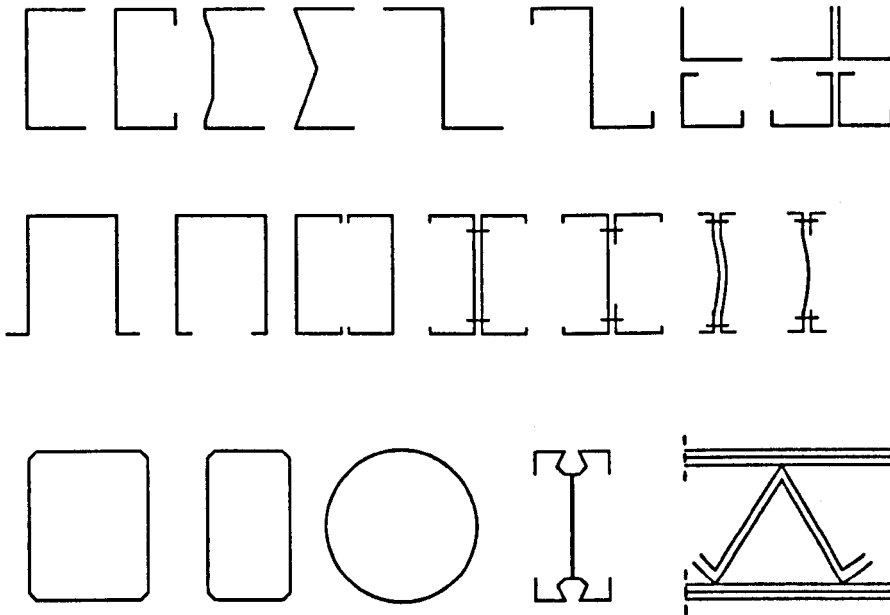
Cold-formed sections used in structural framing. ^[1]
